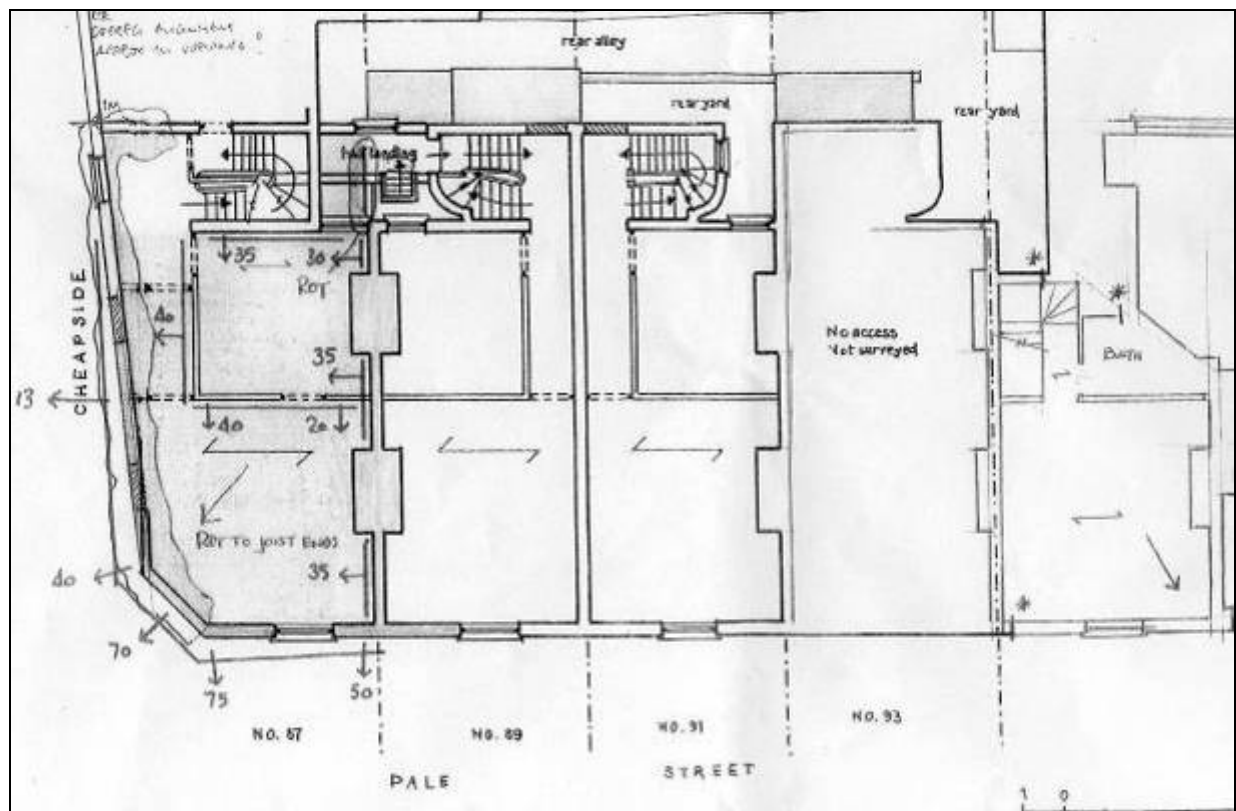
First floor showing rooms reached by hallway from staircase (adapted from Corbett, 2007)
